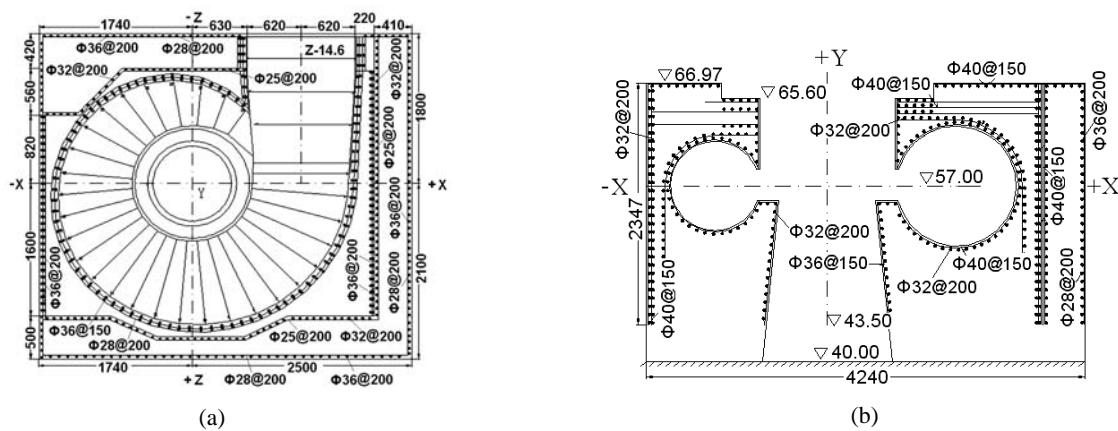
Plane view (a) and vertical view (b) of rebars for concrete surrounding the spiral case
